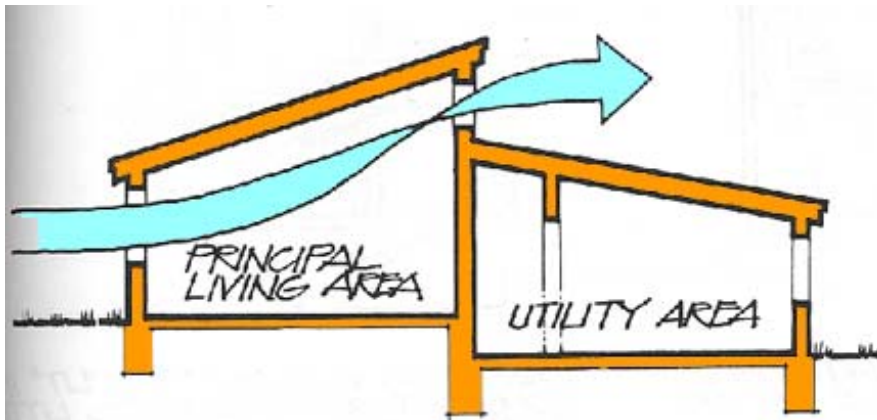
"True" cross ventilation requires both exterior inlets and outlets in same room. A popular way of achieving this in the 1950's and '60's was with split-shed roof and louvers or operable clerestory windows.
